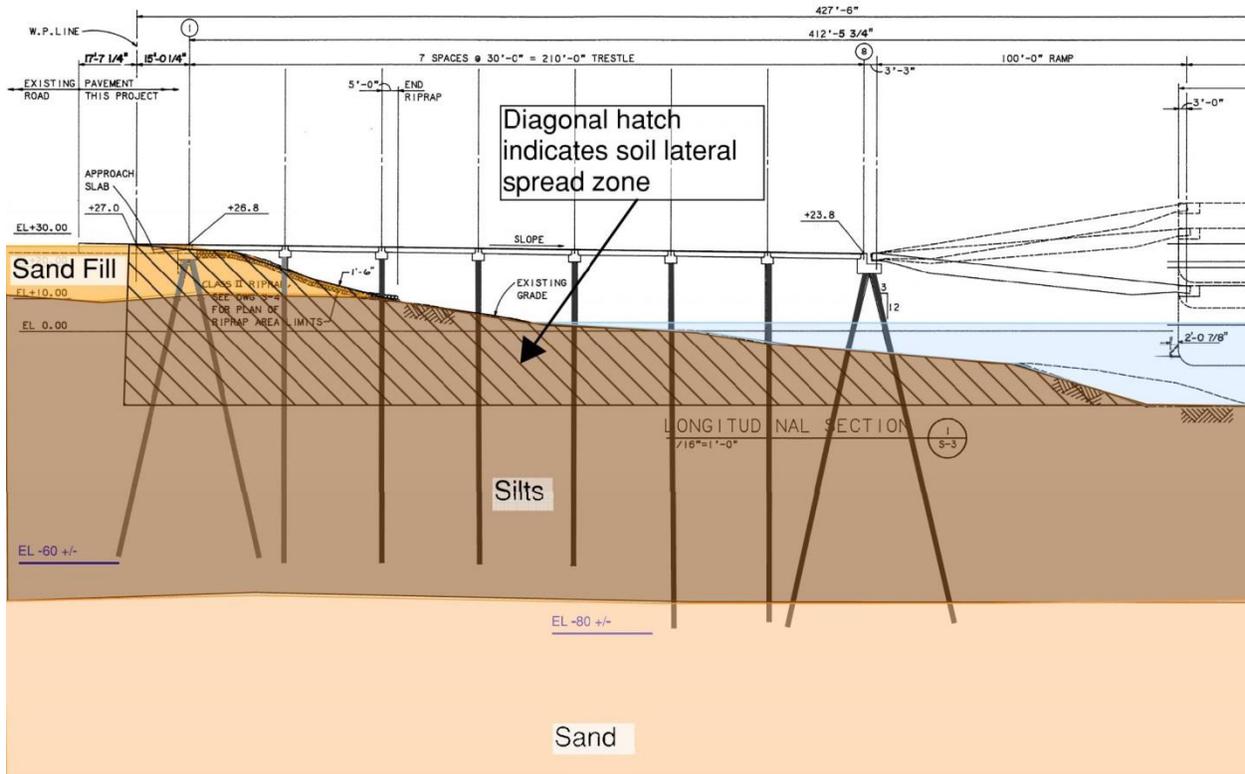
Berth 601 trestle longitudinal section indicating zone of soil lateral spreading
